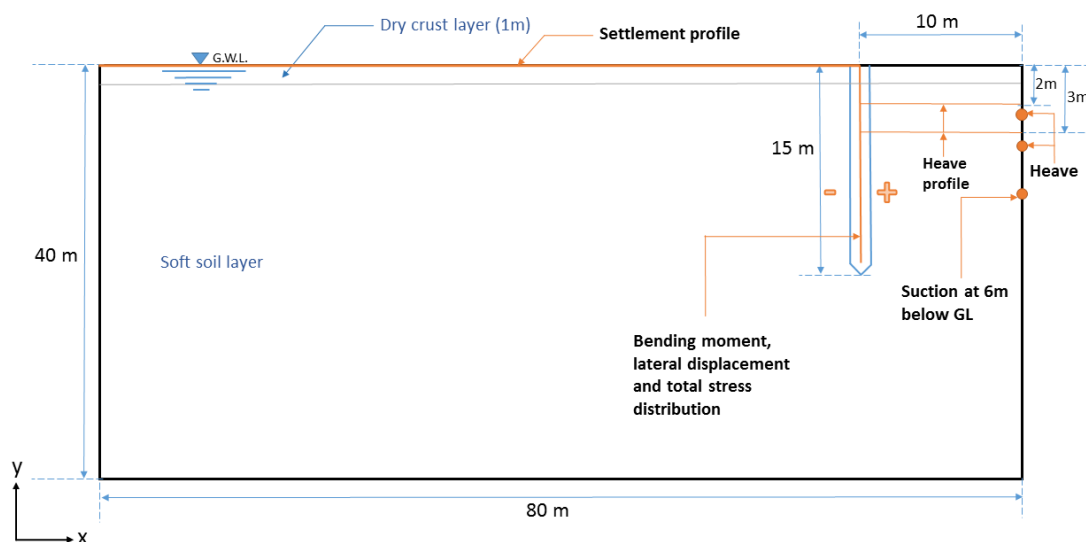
Benchmark of cantilever retaining wall on Utby clay.
